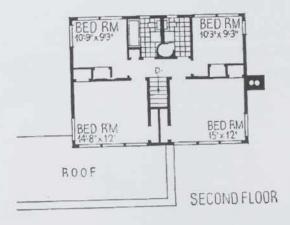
Harris Armstrong House, Oakland, Missouri, 1938, plan.
